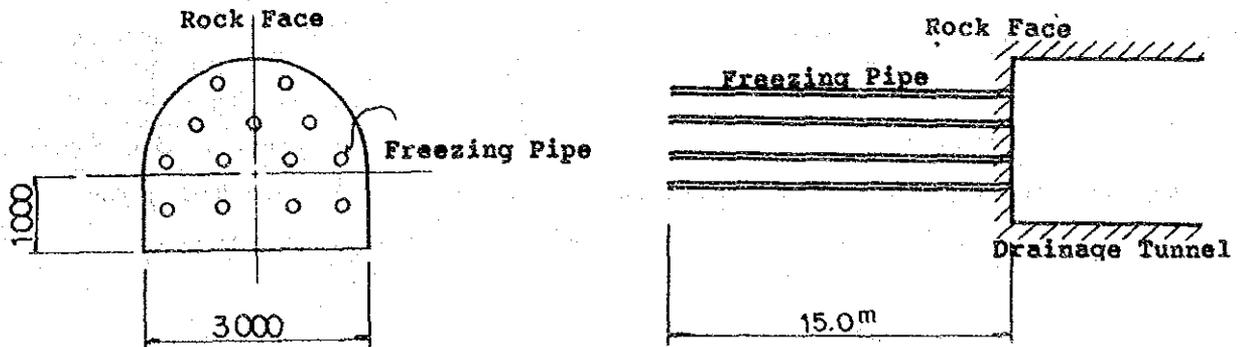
Arrangement of Freezing Pipe in Rock Face
